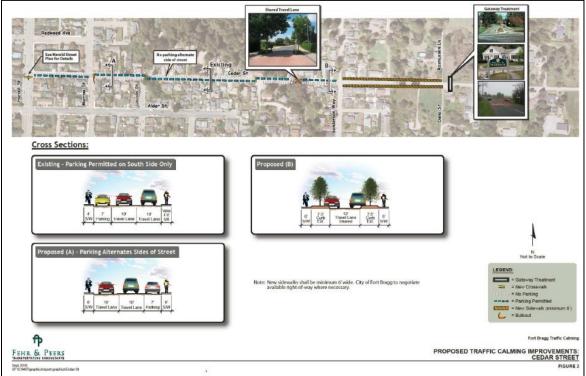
Cedar Street Complete Sidewalk Project Plan (Source: Residential Streets Safety Plan, 2011)
